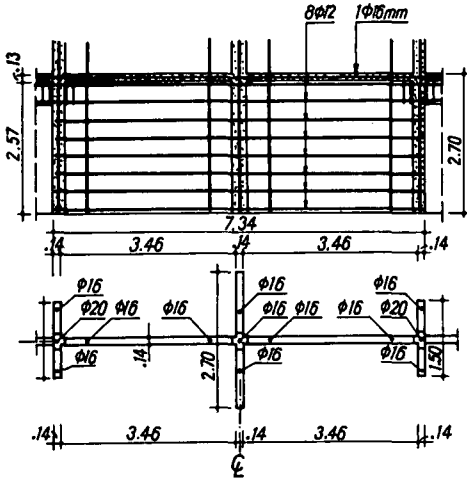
Detail of first storey of shear wall No.3 of long wall DL2(see.Fig.7.3b). Only tie and projecting bars are depicted.
